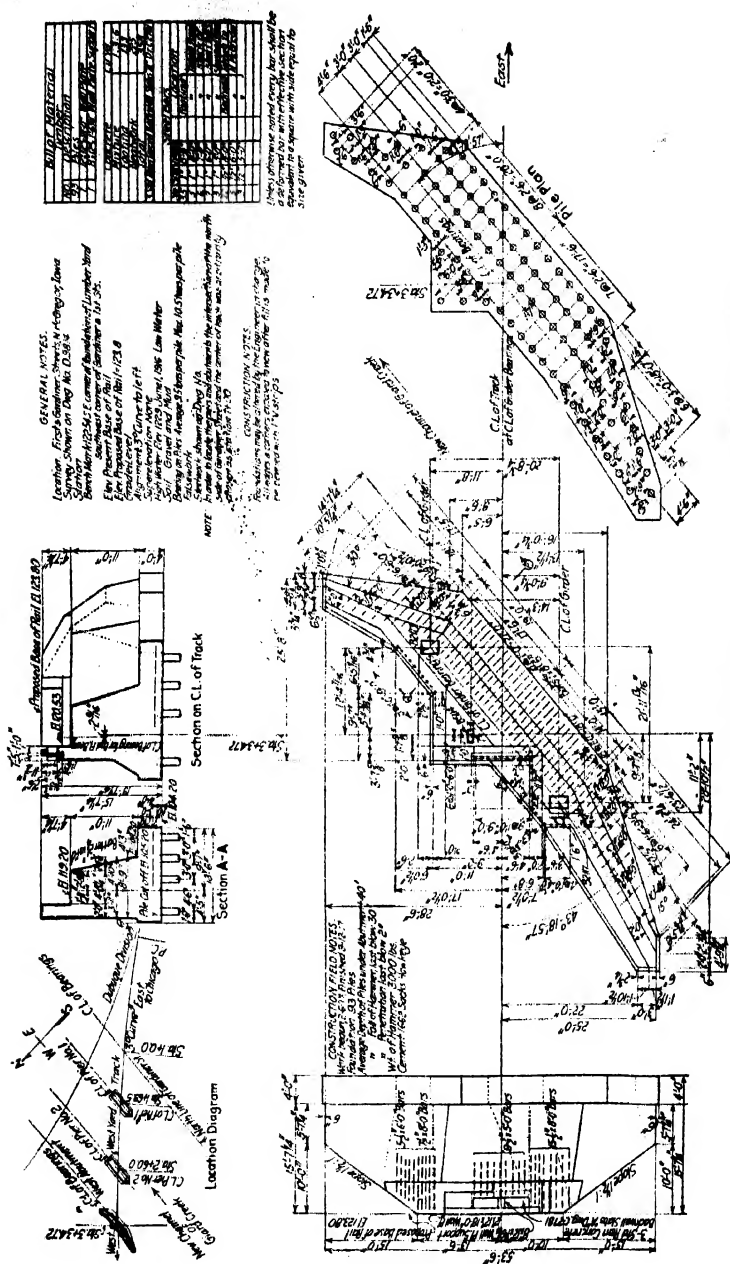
Details of a skew abutment of the C. M. & St. P. Ry.
